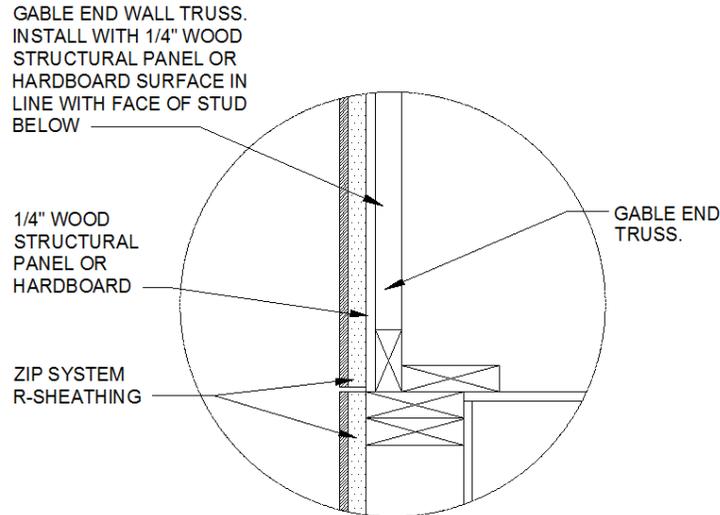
Figure B: Offset Gable End Truss – Ignition Barrier Option 1
